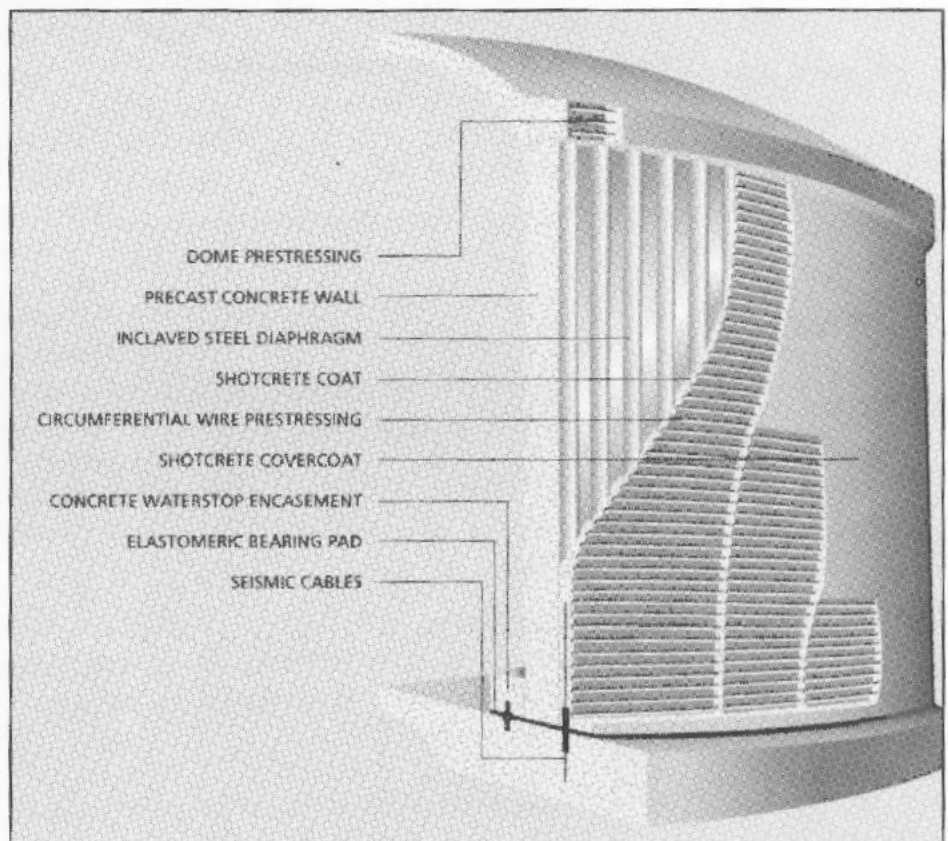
Typical Cross Section of Wirewound-Prestressed Concrete Tank
